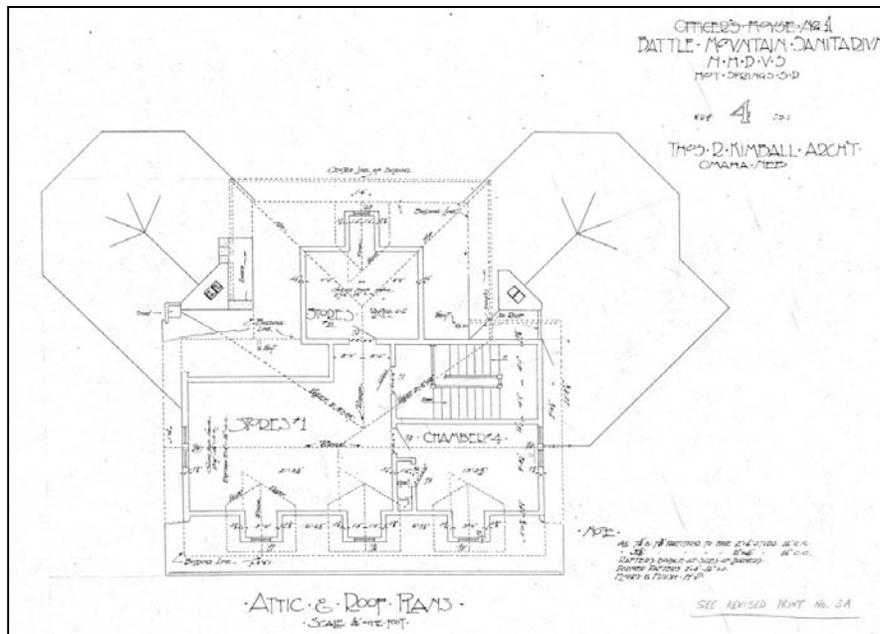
Thomas Rogers Kimball, Attic Floor Plan, "Officer's House No. 1."
